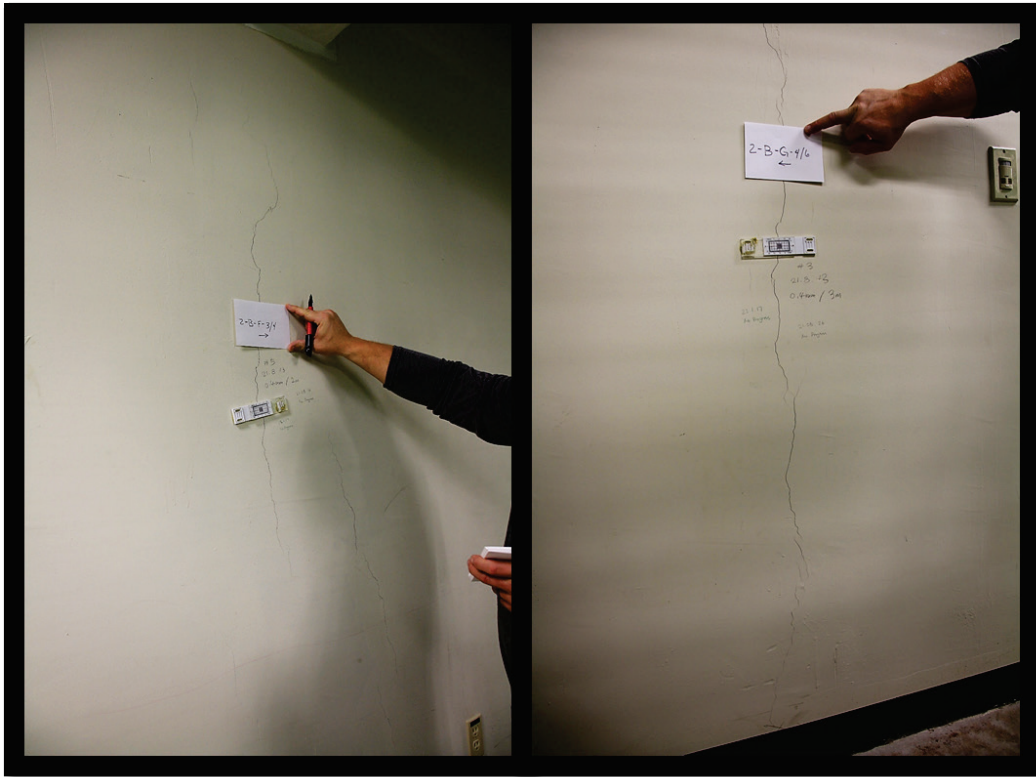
Wall crack with gauge in Tower 2 basement.
